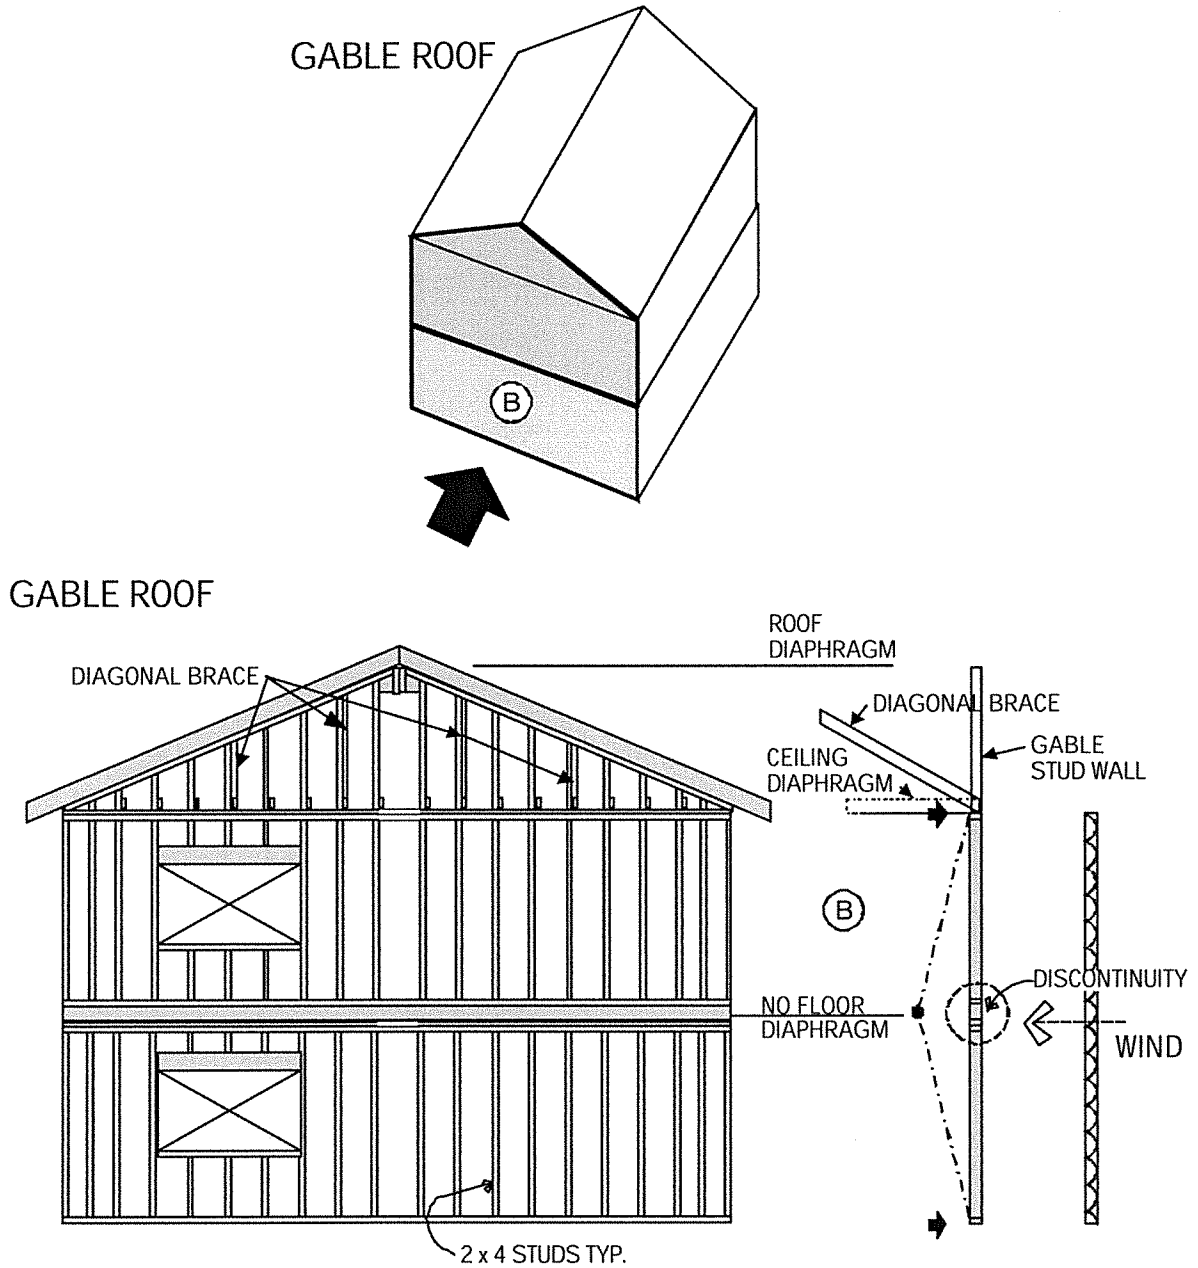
Stability - Wind on Two-Story Space End Wall
